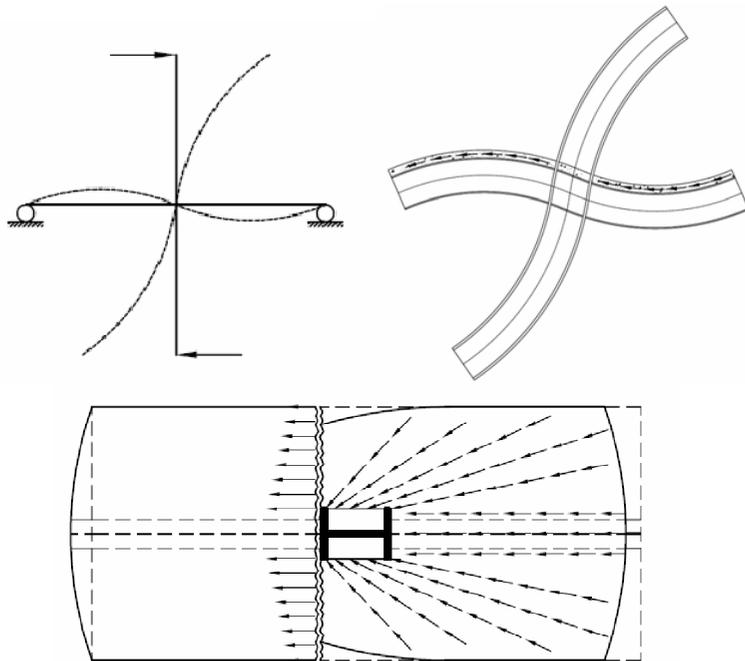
Composite beam under lateral loads and related slab force transfer mechanism
